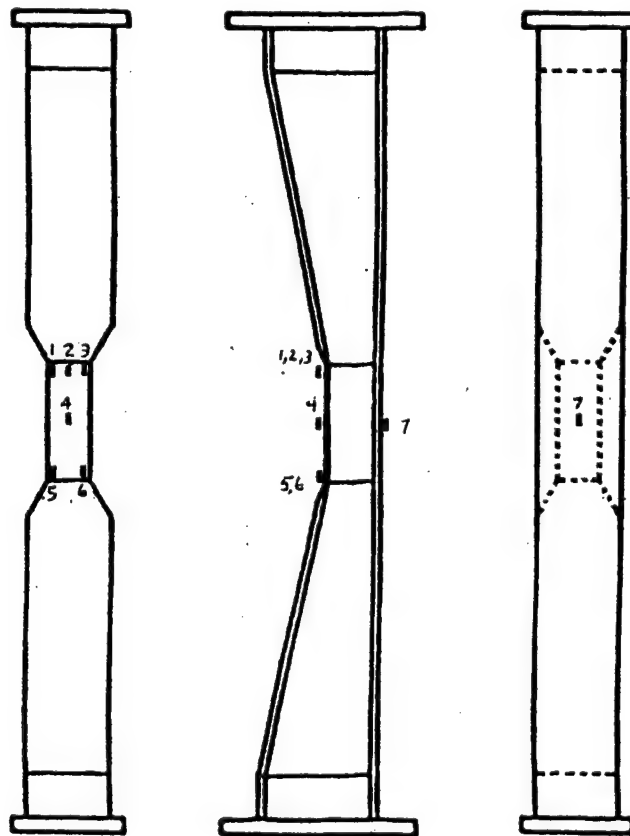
Strain Gage Layout and Data for Stiffener Splice Detail
